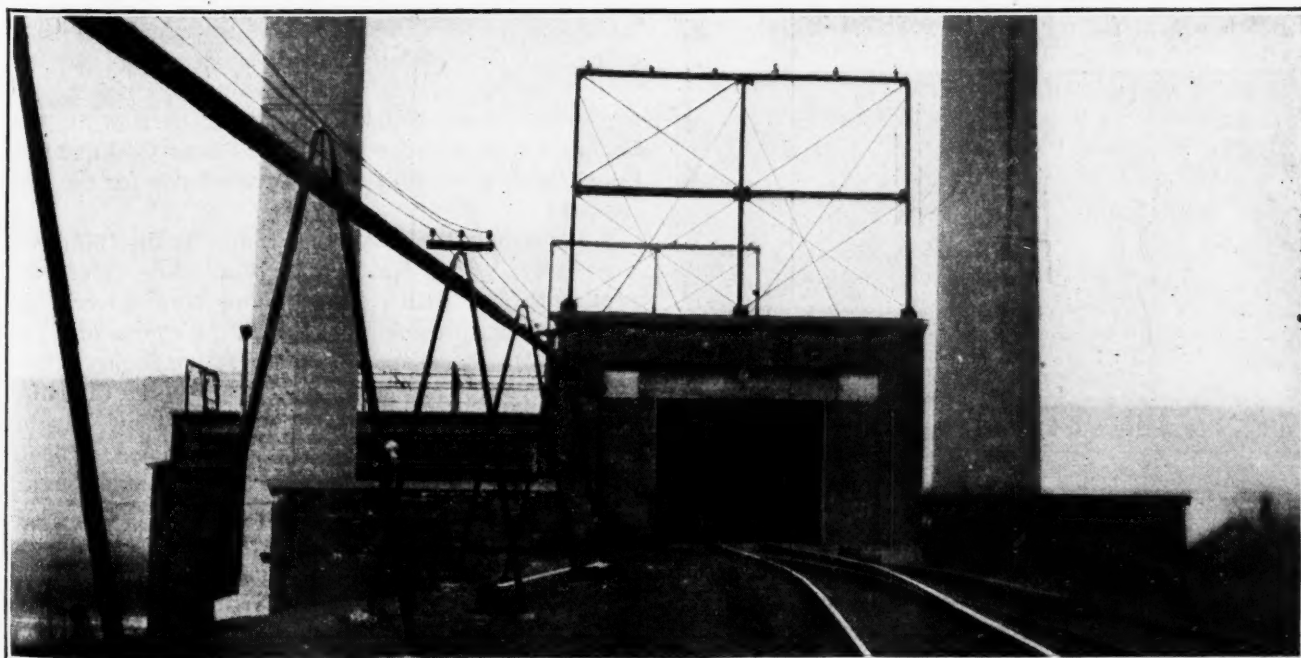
UPPER END OF BOILER PLANT SHOWING CARS ON FUEL TRACK ABOVE BOILER BUNKERS
